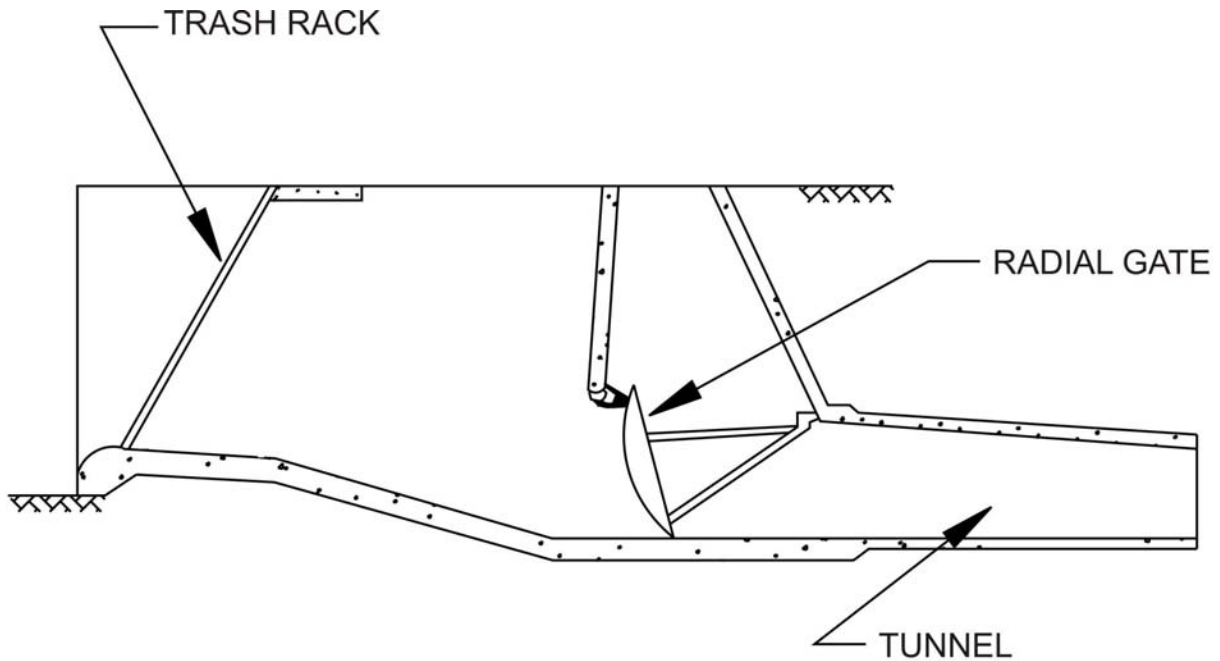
OUTLET FOR LOW-HEAD INSTALLATION WITH FREE-FLOW DOWNSTREAM TUNNEL
